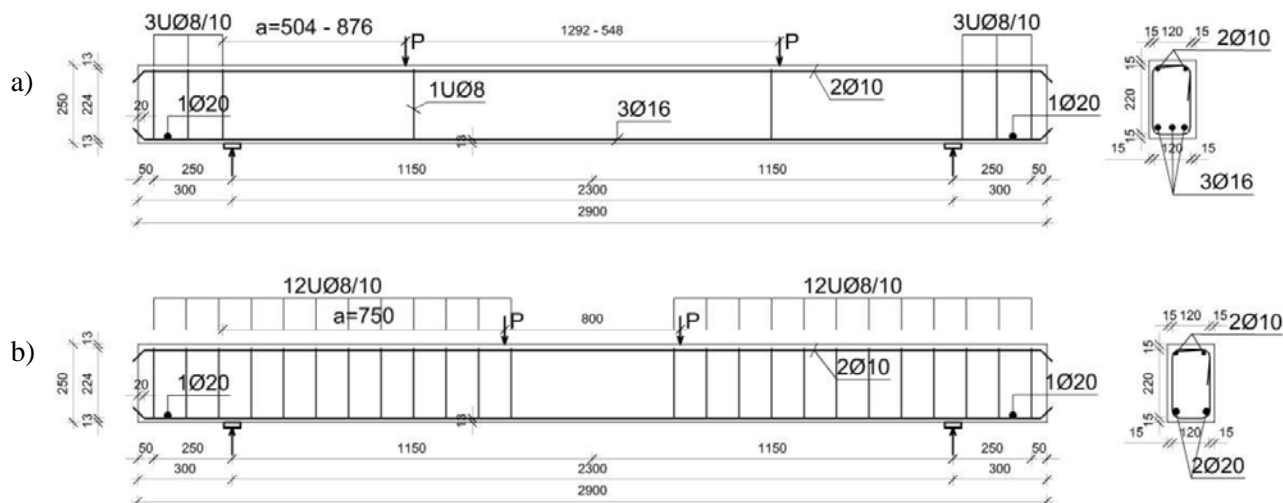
Reinforcement and cross section details for the beams a) without and b) with shear reinforcement
